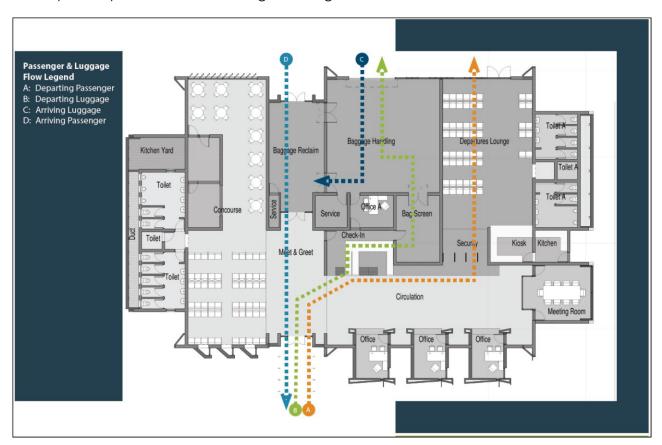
CONCEPTUAL TERMINAL LAYOUT
